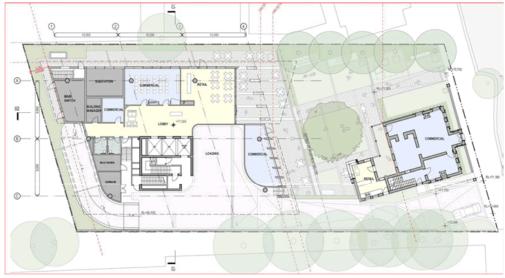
Site plan showing the relationship of the proposed commercial tower to the west of the heritage building. This drawing also shows the recaptured footprint of the former bank building as it addresses Queen Street. The setting of the building is supported by the implementation of an appropriate landscape setting, including the retention of mature trees on the site. Source: FJMT Studio
